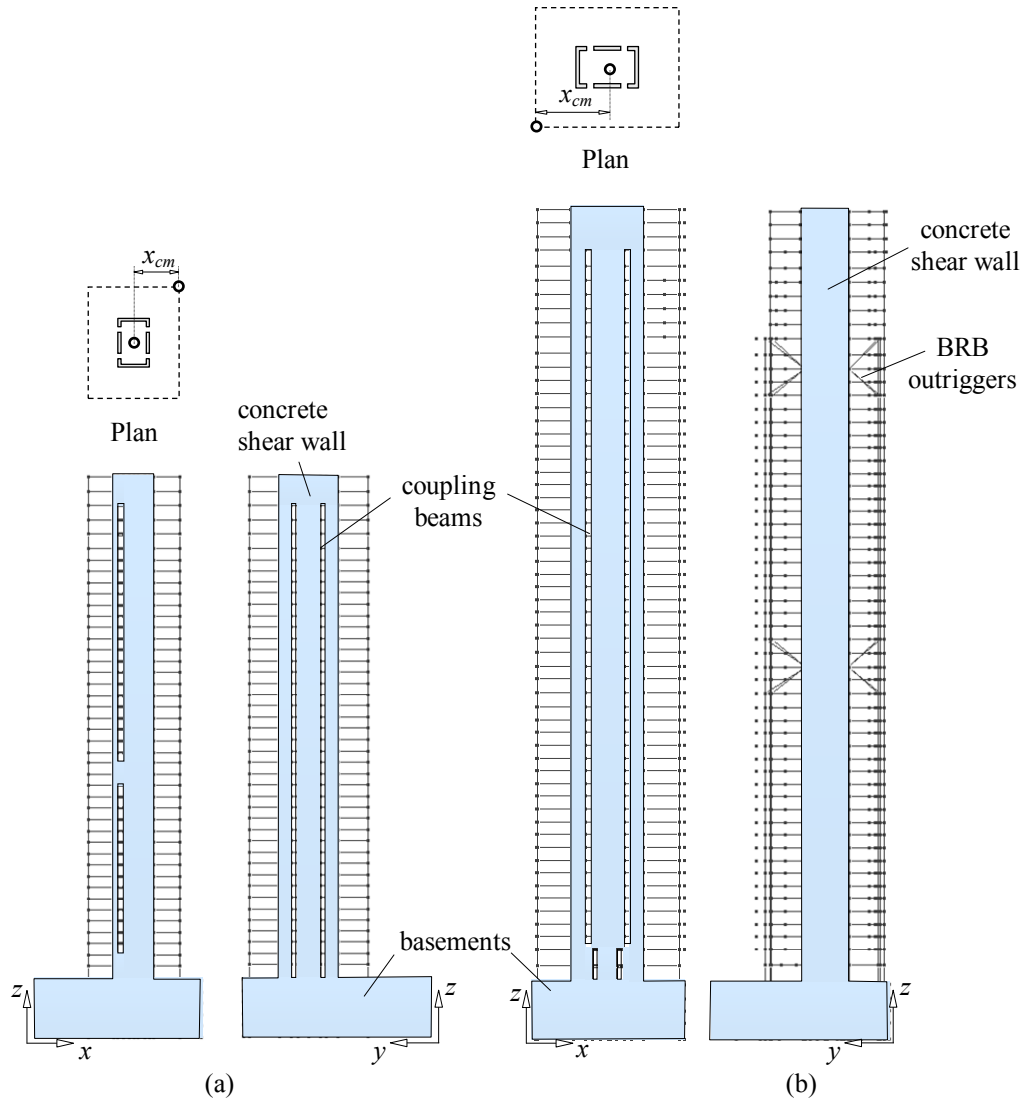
Elevations: (a) CW48 building; (b) CW62 building.
